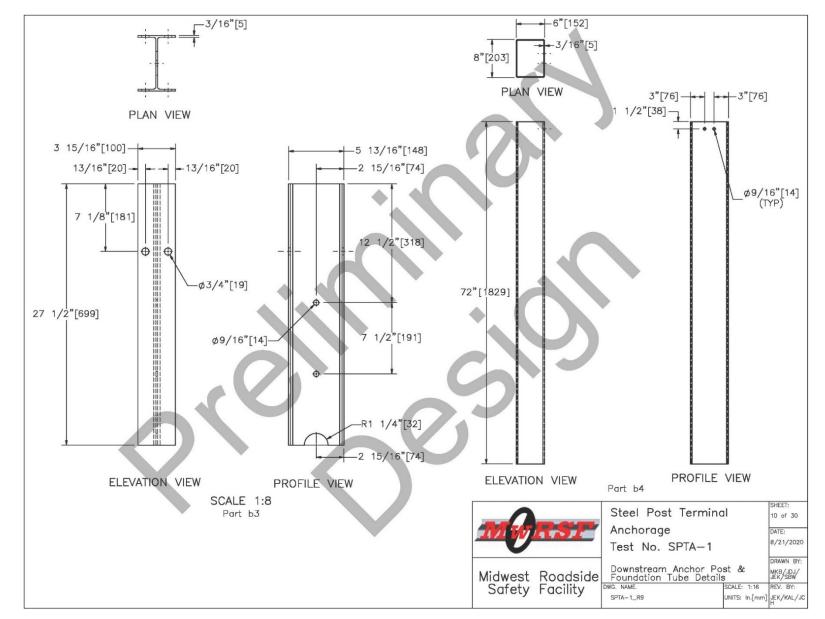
Downstream Anchor Post and Foundation Tube Details, Test No. SPTA-1
